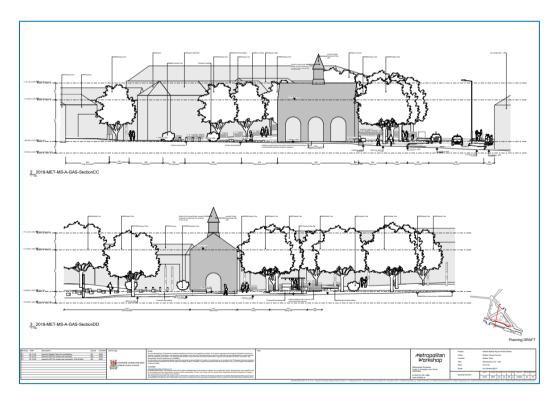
Site Section Plan (Source: Metropolitan Workshop)
